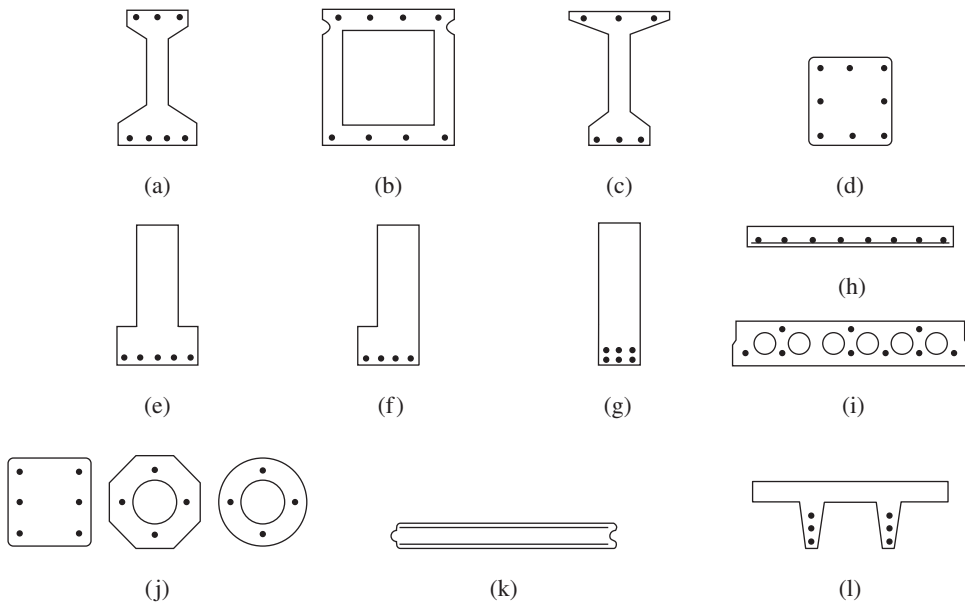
Common precast and prestressed concrete products (a) I-beam (b) Box beam (c) Bulb tee (d) Column (e) Inverted tee beam (f) Ledger beam (g) Rectangular beam (h) Slab (i) Hollow-core slab (j) Pile sections (k) Sheet pile (l) Double tee
